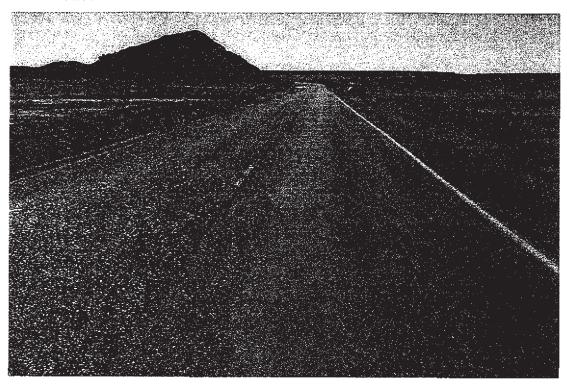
MP 14.10 Typical Pavement Section, Note Bleeding
